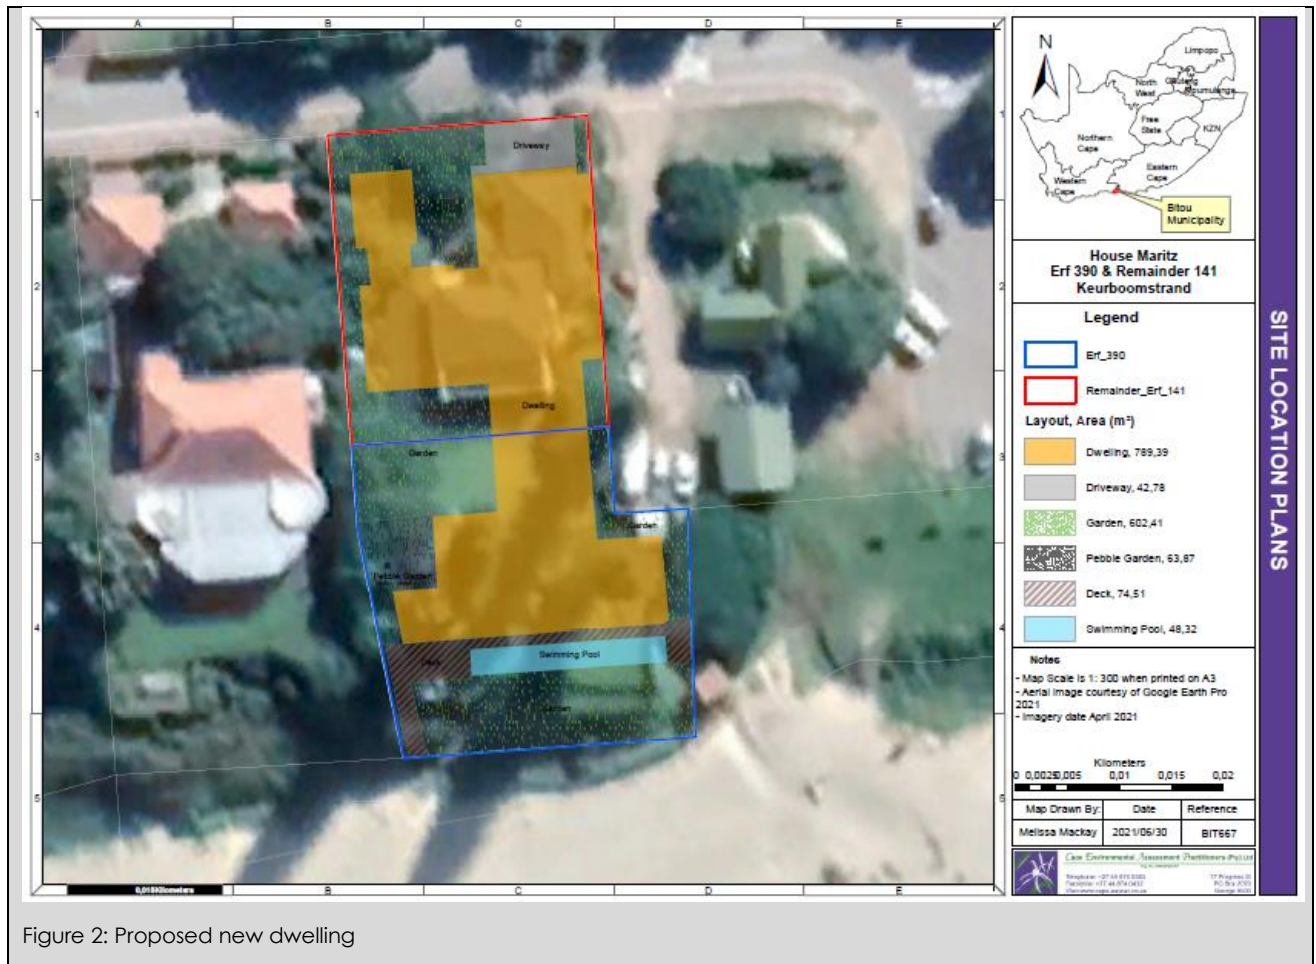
Proposed new dwelling (CLD Architects, 2021)
